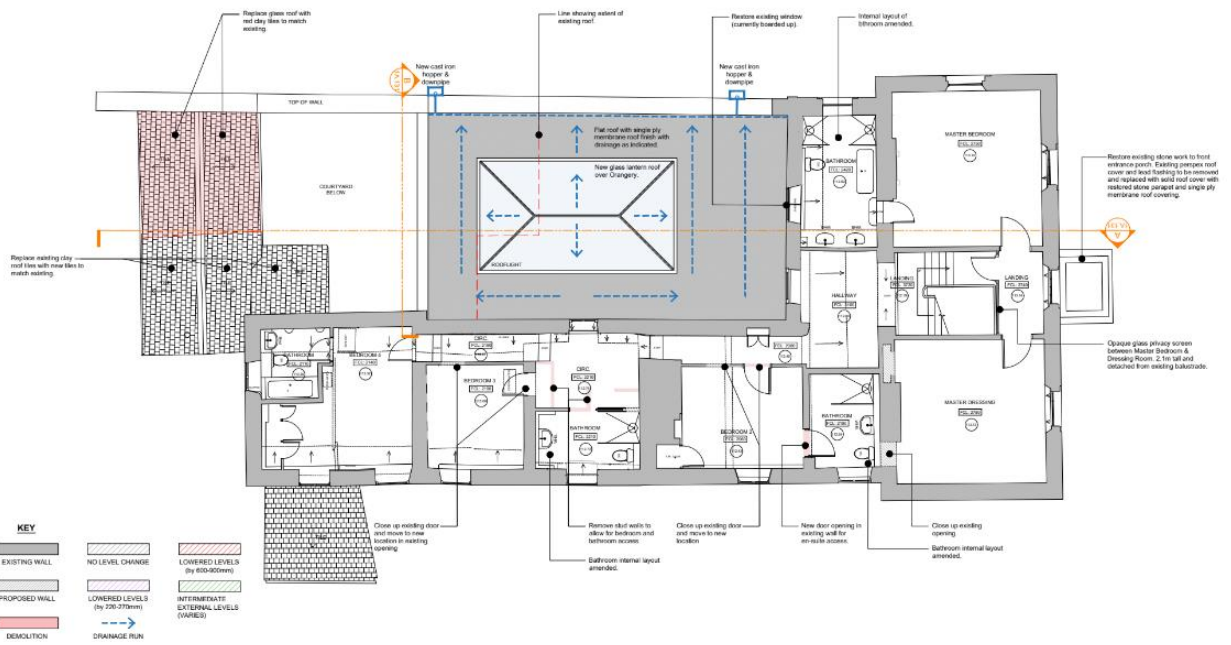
Proposed First Floor (Concept Eight Architects, 2023)
